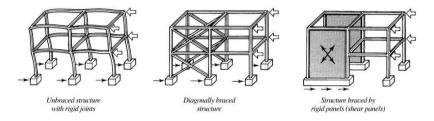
Use of diagonal bracing in frame structures. (Adapted from material in Multi-storey Buildings in Steel by Hart, Henn and Sontag)
